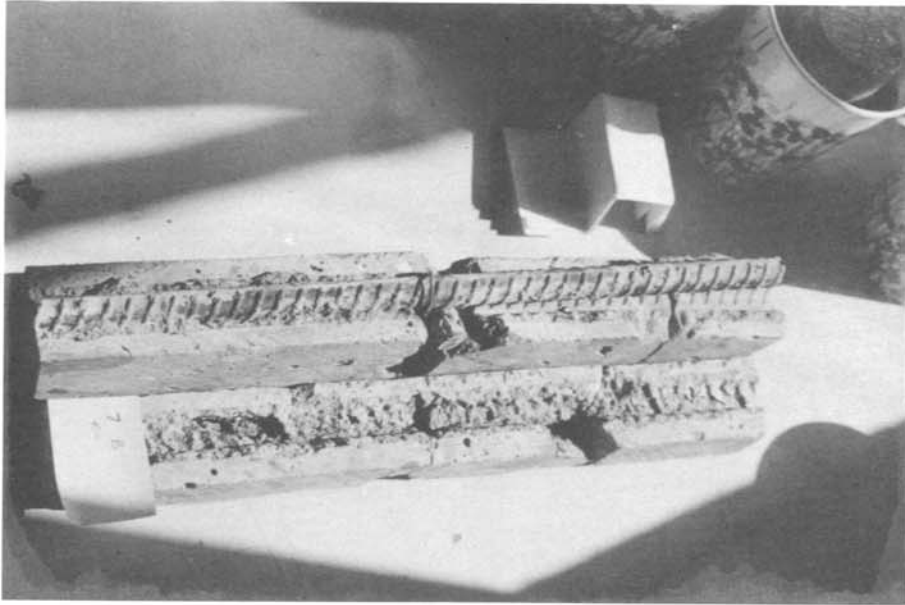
Slice of concrete containing the transverse reinforcement on Sample No. 7. Note poor consolidation and active corrosion of the steel.
